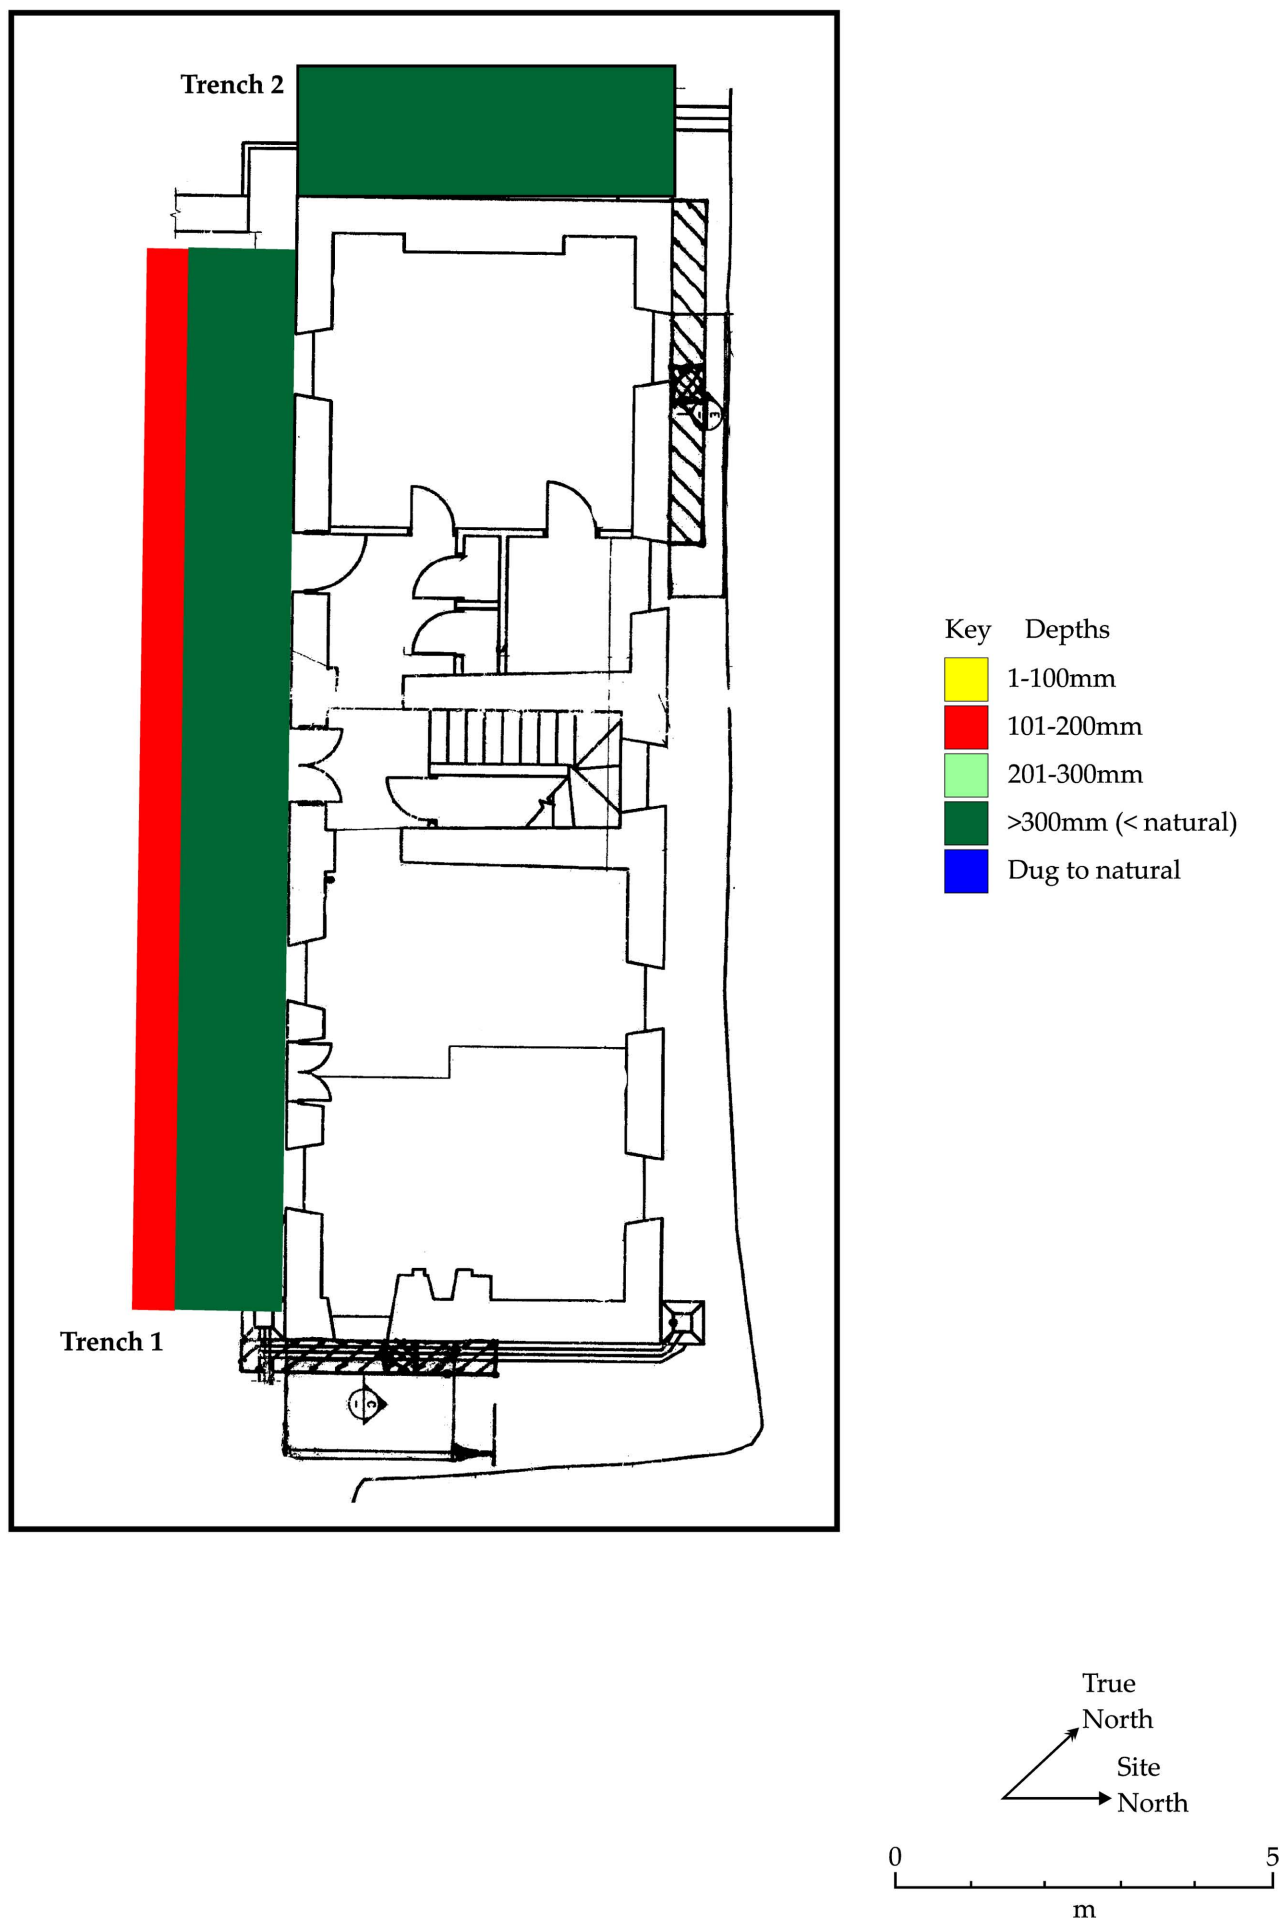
Plan of French Prison showing location of Trenches 1& 2
